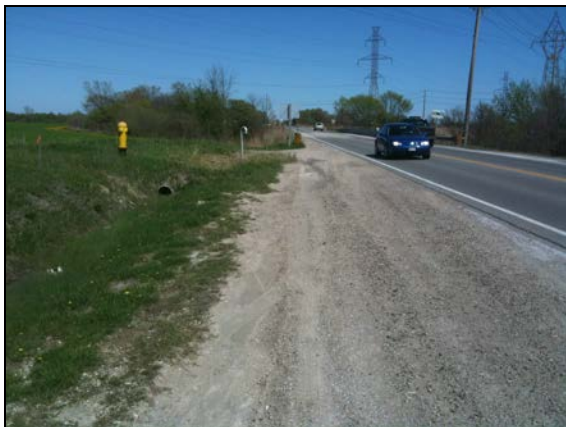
County Road 42 facing east, note disturbance due to ditching and services up to property line.
